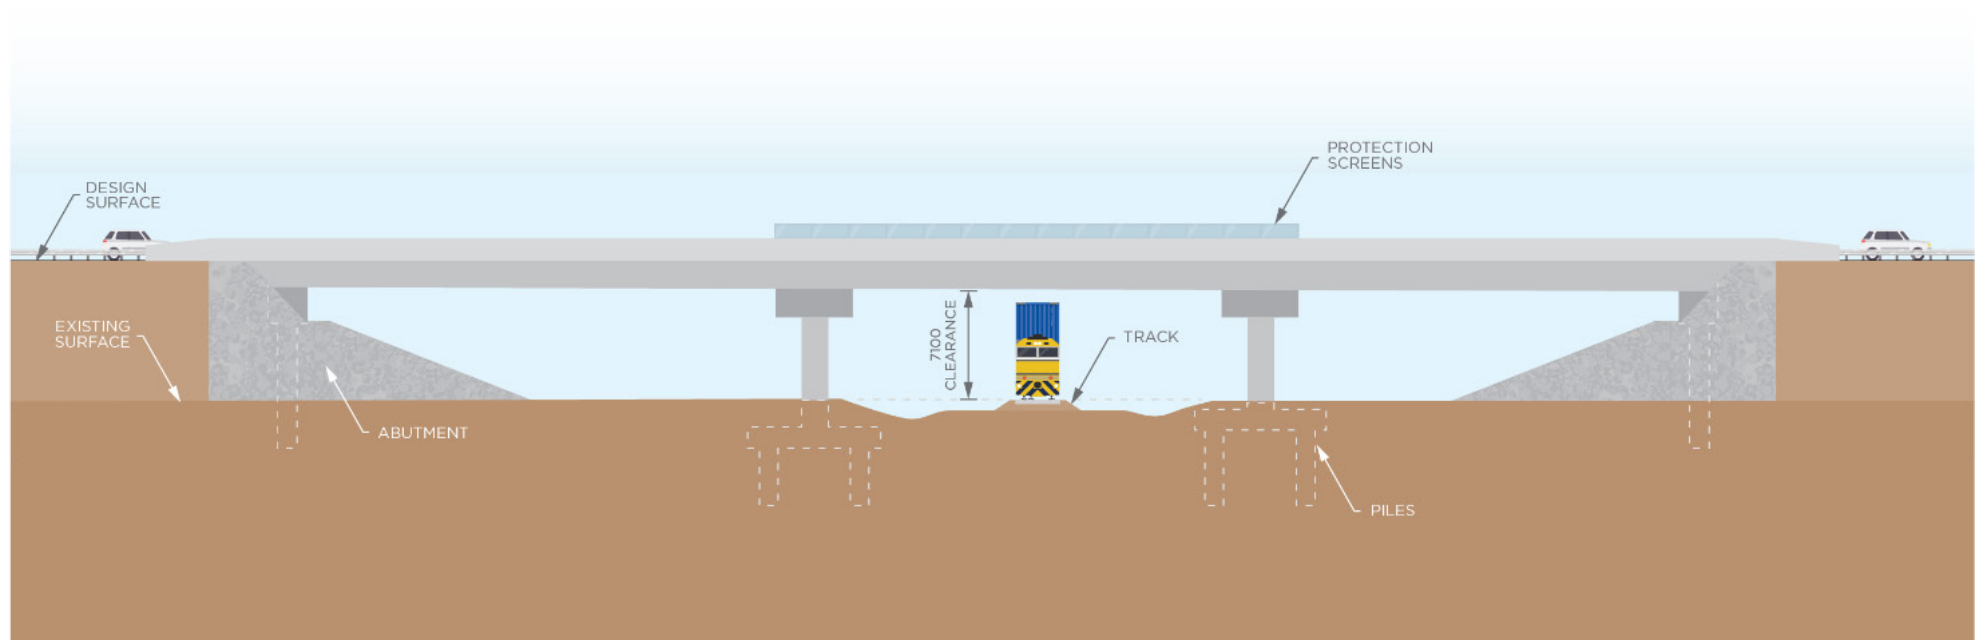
TYPICAL SECTION OF ROAD-OVER-RAIL BRIDGE STRUCTURE
